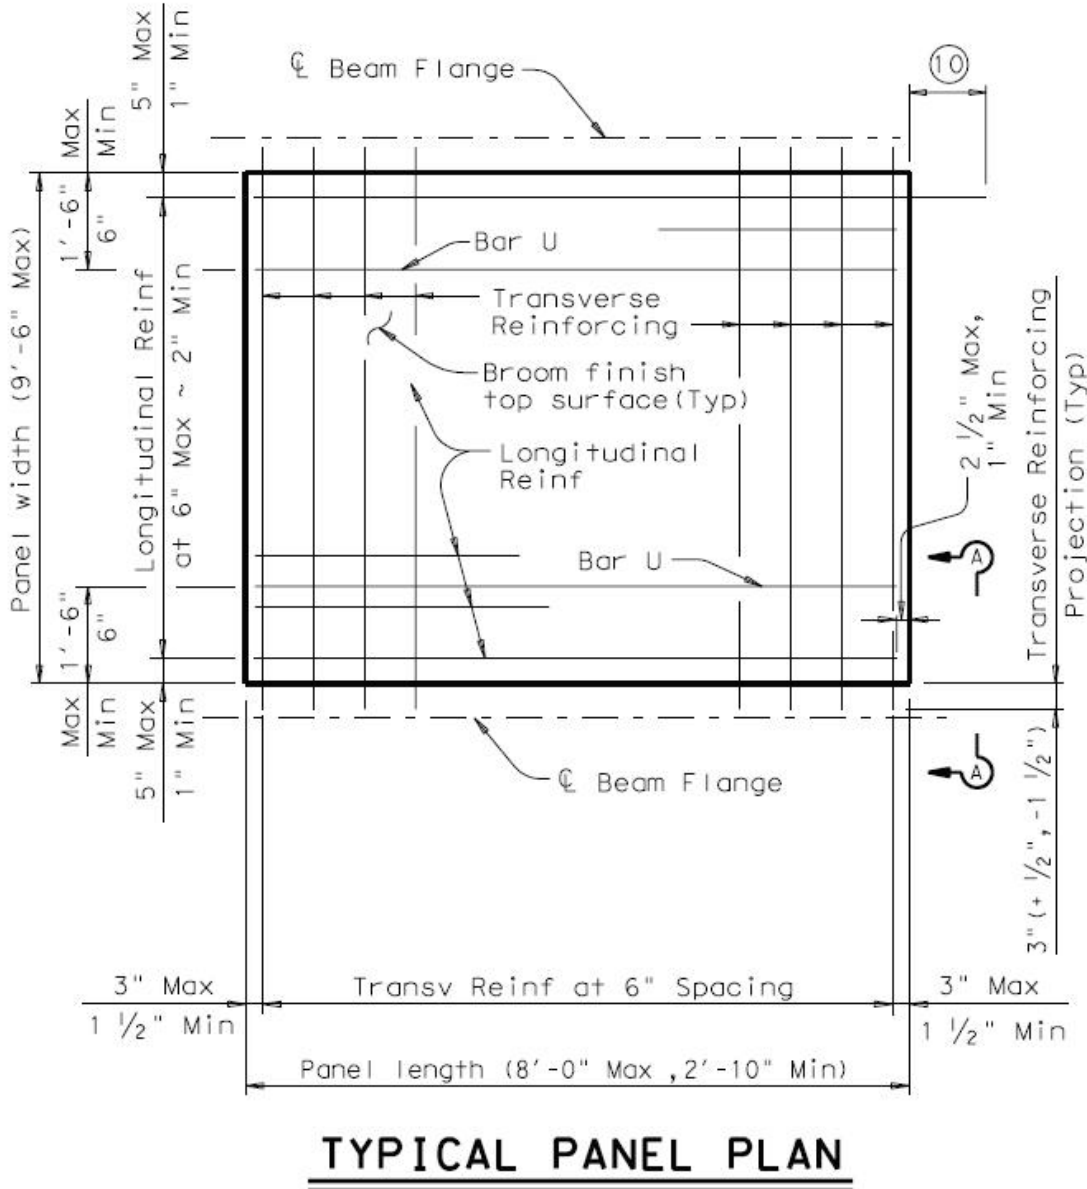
TxDOT plan view of typical precast, prestressed panel
